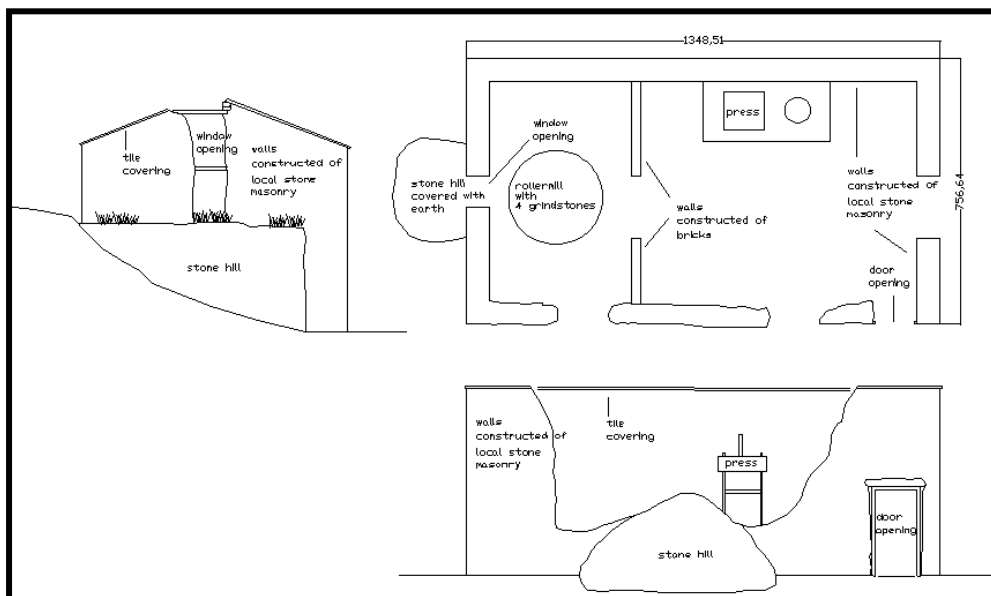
Existing plan and façade schemes of the mill in Çukurköy in 2006
